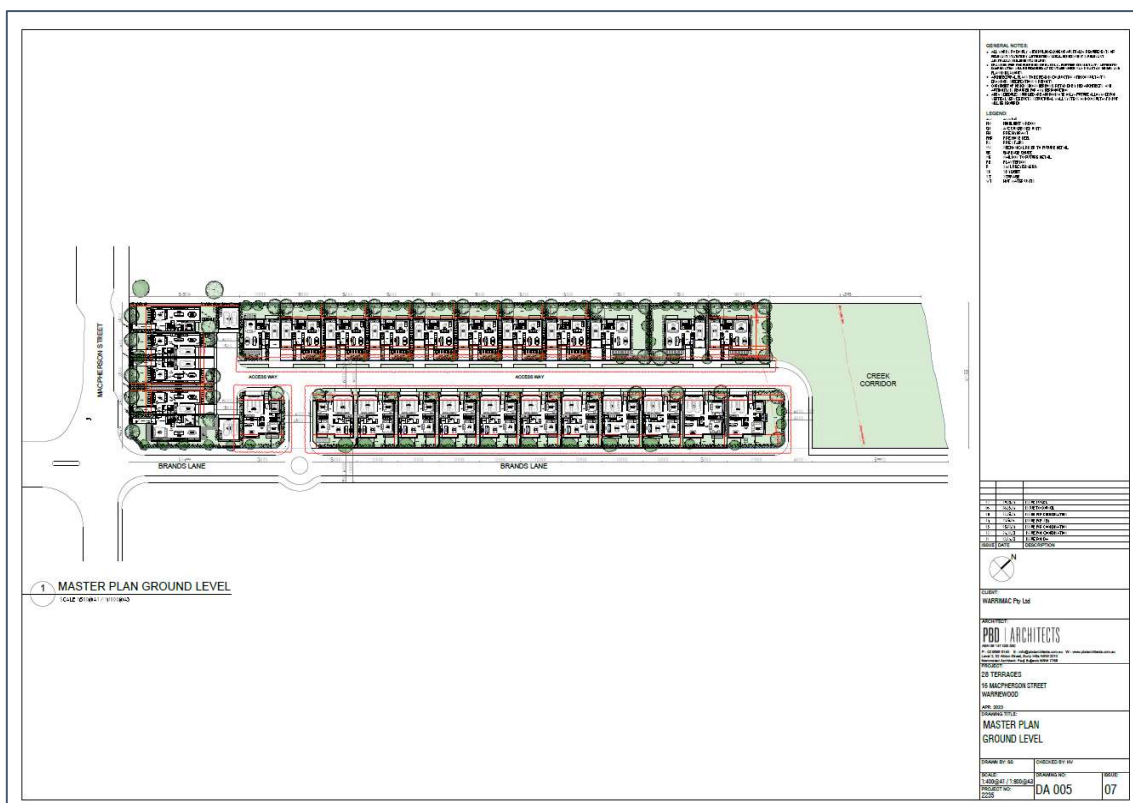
Approved ground floor master plan (Source: PBD Architects)
